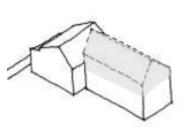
Design suggestions for rear additions to contributory buildings, applicable to single storey houses, multi storey houses or flat buildings:
